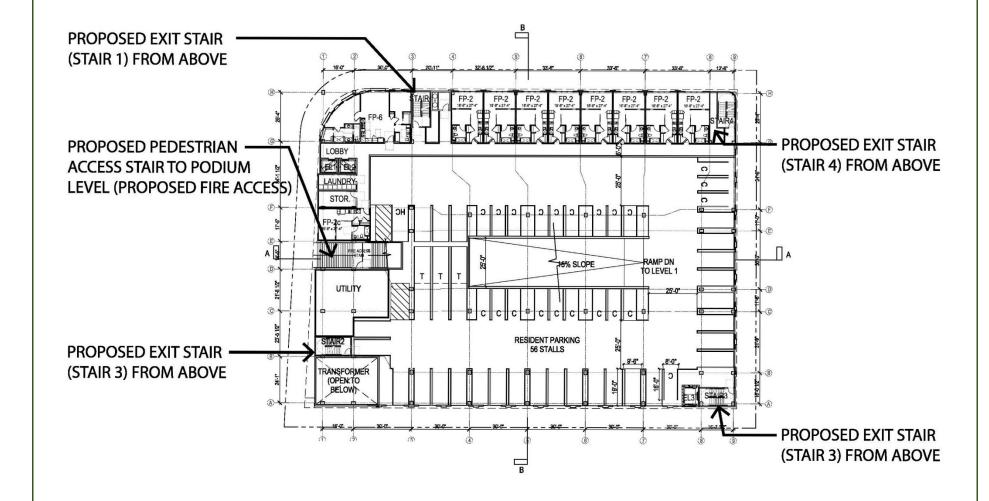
Fire Master Plan – Level 3 (Courtyard)
